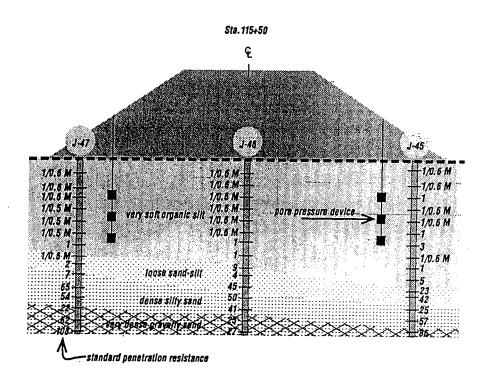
Soil cross section at wood fiber fill location Washington site.⁽²¹⁾
